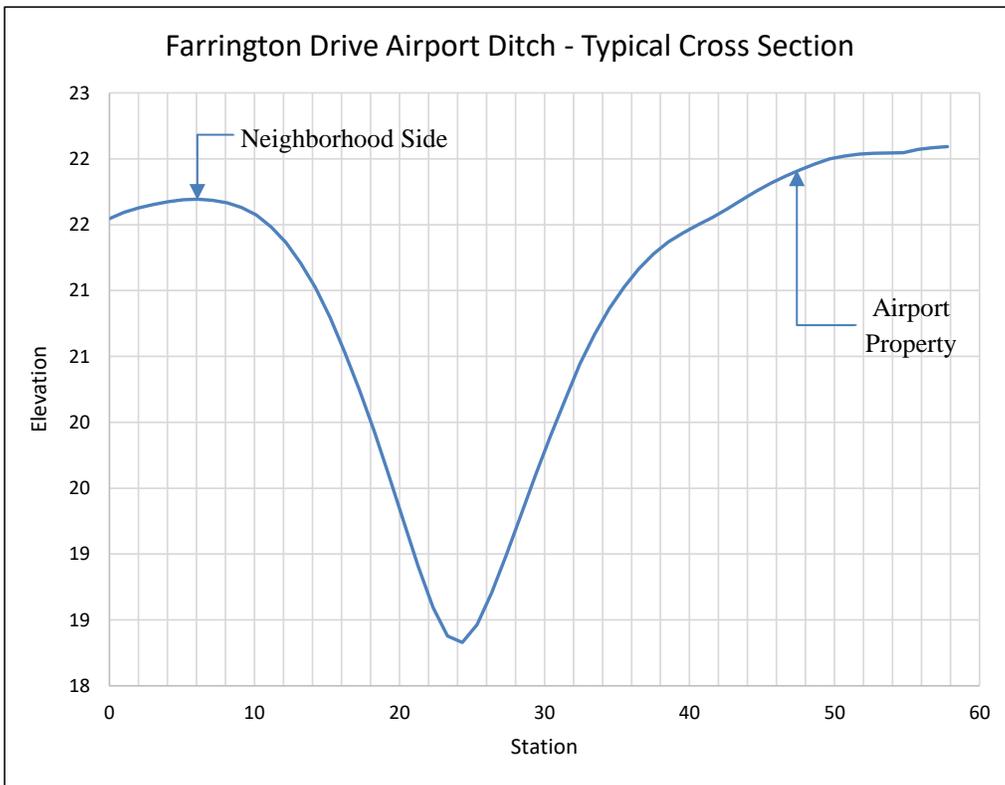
Farrington Drive Roadside Ditch Typical Cross Section
